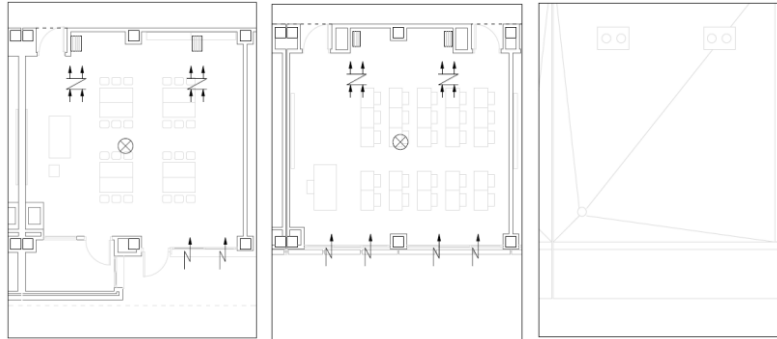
Standard classroom NVS model plants. Left) ground floor, middle) first floor plant and right) roof
